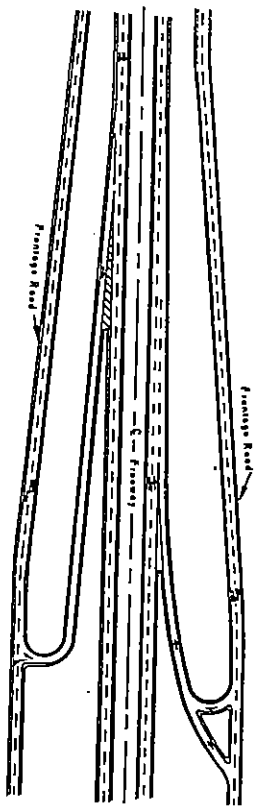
Two-way frontage roads, entrance and exit ramps.
